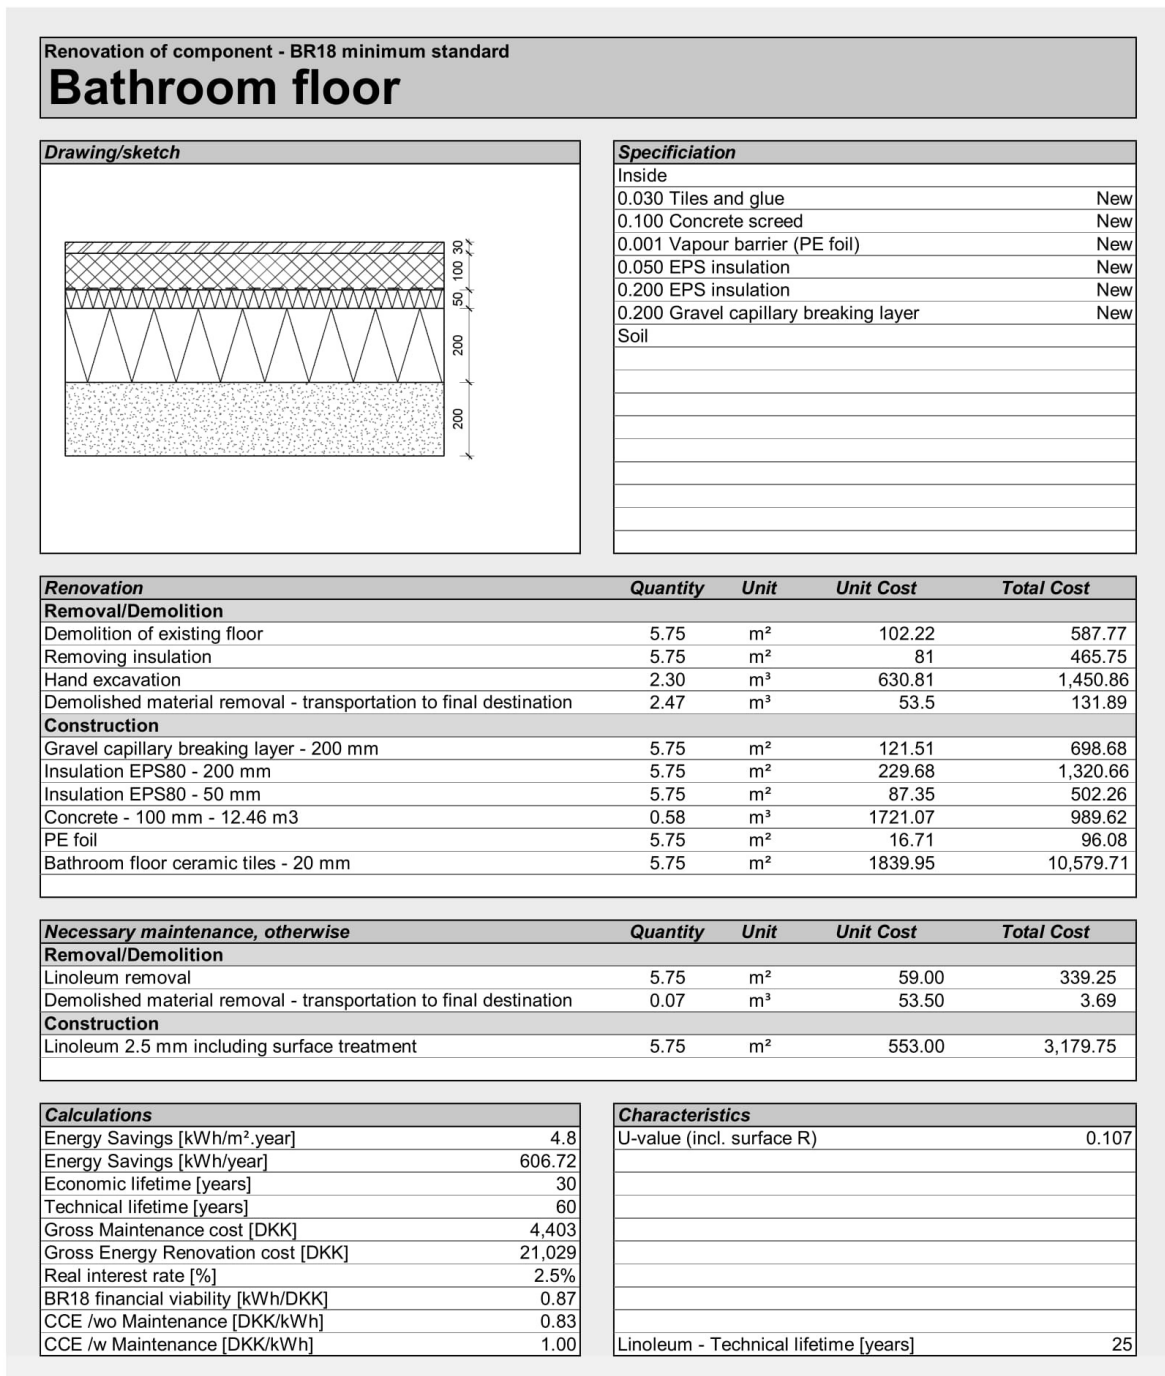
BR18 standard, Reconstruction of the ground supported floor in the wetrooms
